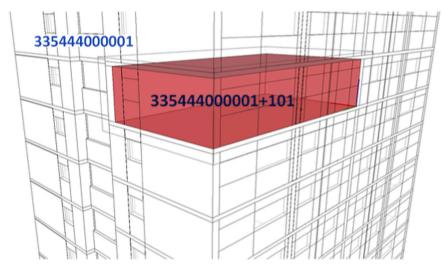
3D model of building and apartment (Zagreb, Trnsko 12, tenth floor).
